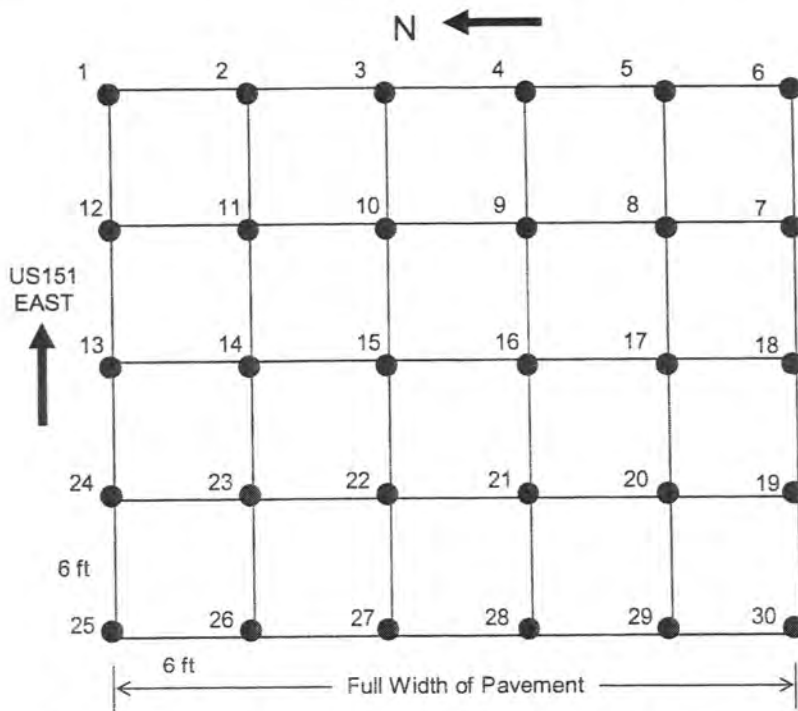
Grid Setup for Testing at US 151 Base Construction Site
